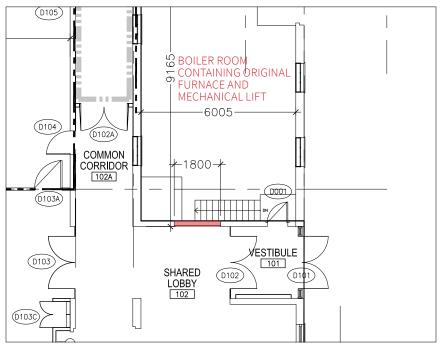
Sketch of structural details in plan and section showing deck reinforcing at water-damaged areas (Blackwell, 2017).. Fig 68: Detail of proposed ground floor plan showing location of interior window (highlighted in red) that allows views into original boiler room below (LGA, 2017).
